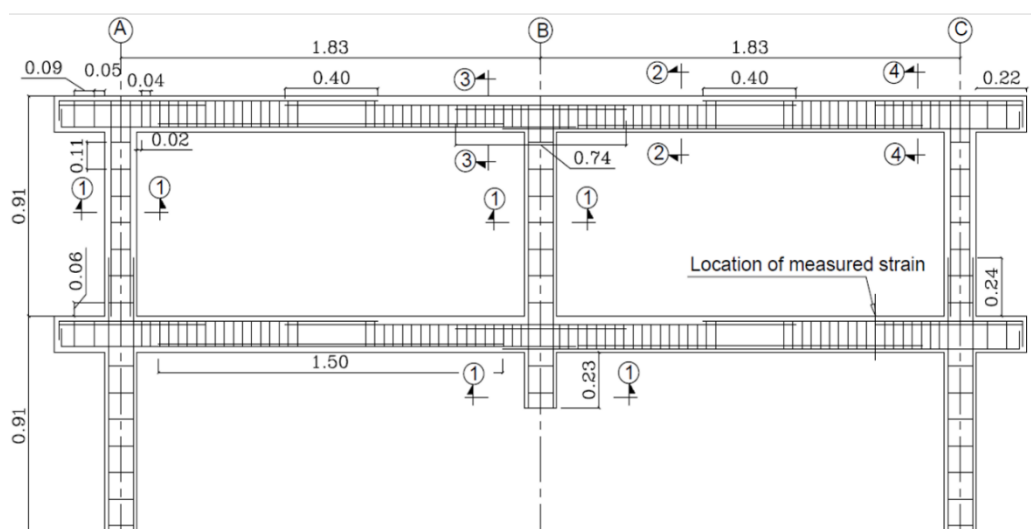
Concrete Dimensions and Reinforcement Details of 2-D 2-Story Frame [19] (All Dimensions are in mm).
